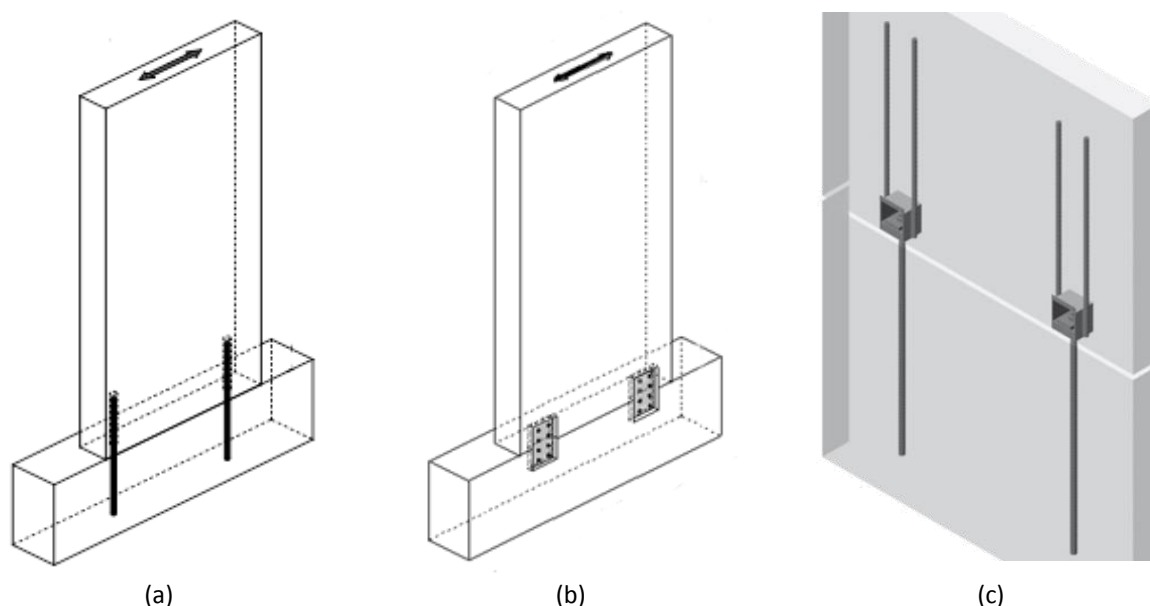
(a) “rebar connections”; (b) “steel plate connections”; (c) industrial type wall shoe.
